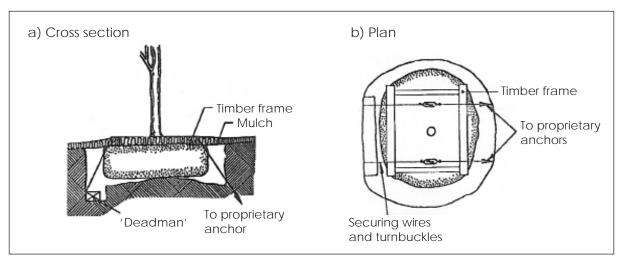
'Deadman' or proprietory anchors for underground anchoring of rootballs Source: BS 4043:1989 Transplanting root-balled trees - Figure 3
